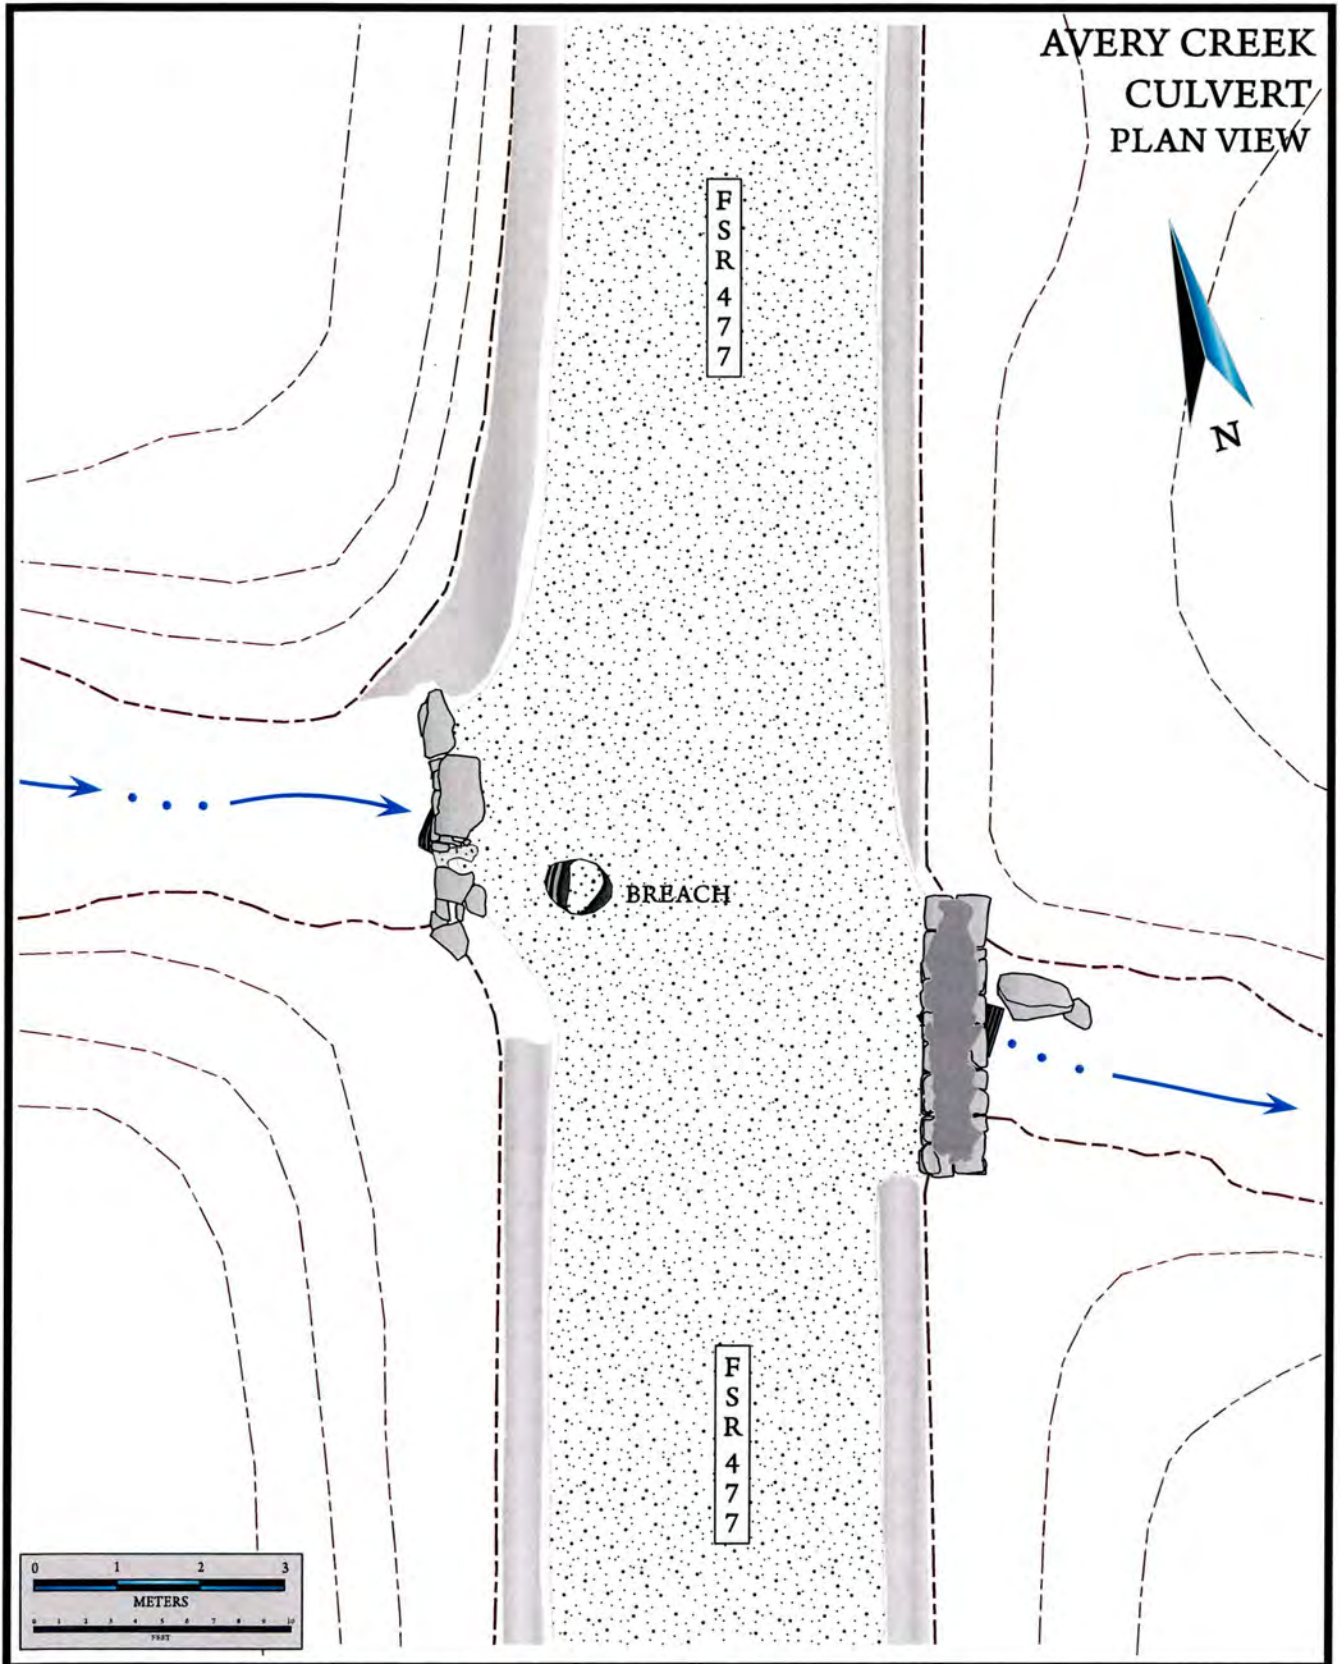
Plan view drawing of the Avery Creek Road culvert on FSR 477.
